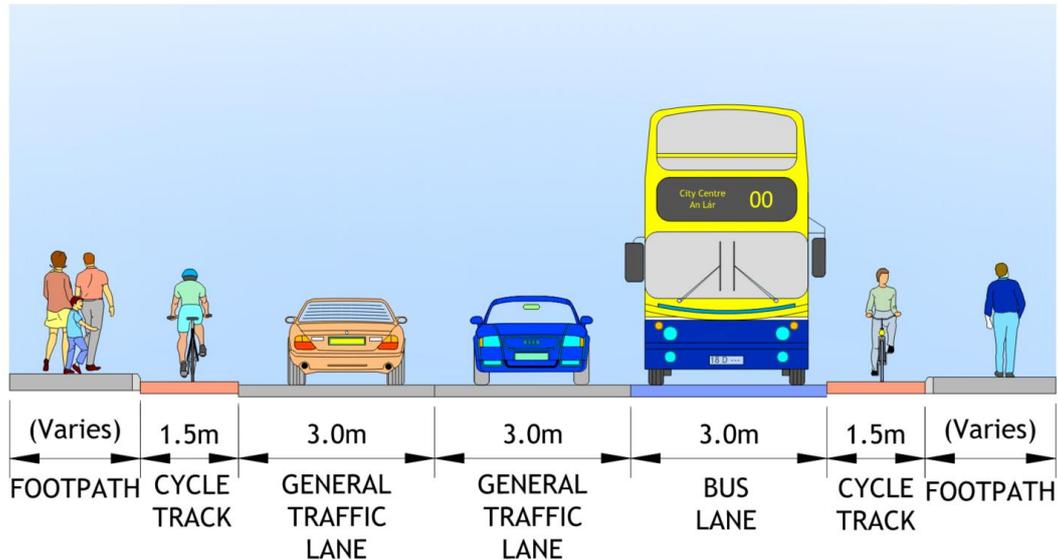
Cross-Section C-C (relevant to RF3, RF5 & RF8)
